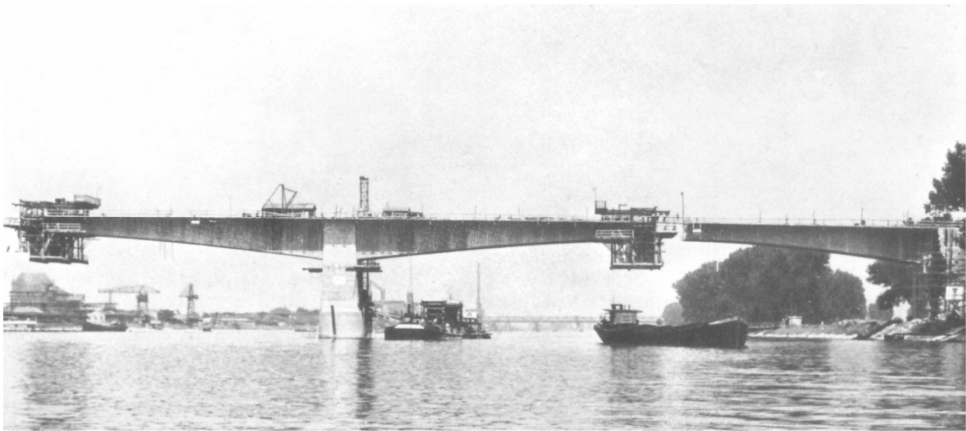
Cantilevering construction of the *Nibelungenbrücke* in Worms (Finsterwalder and Knittel 1953, Abb. 16)
